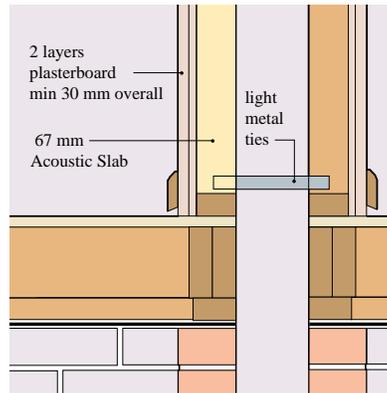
Rockwool Acoustic Slab or Timber Batts as insulation to timber framed separating walls.
